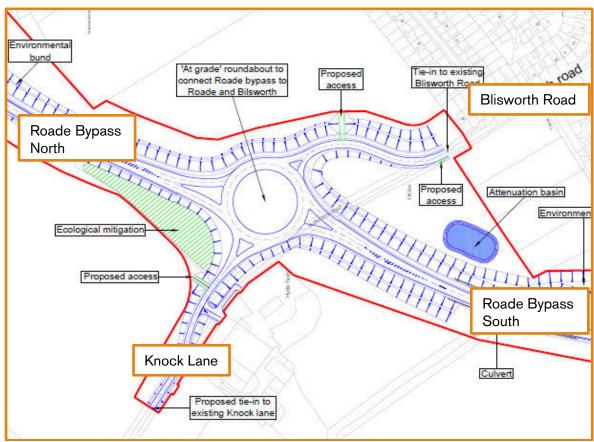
Blisworth Road/Knock Lane/Roade bypass 4-arm roundabout
